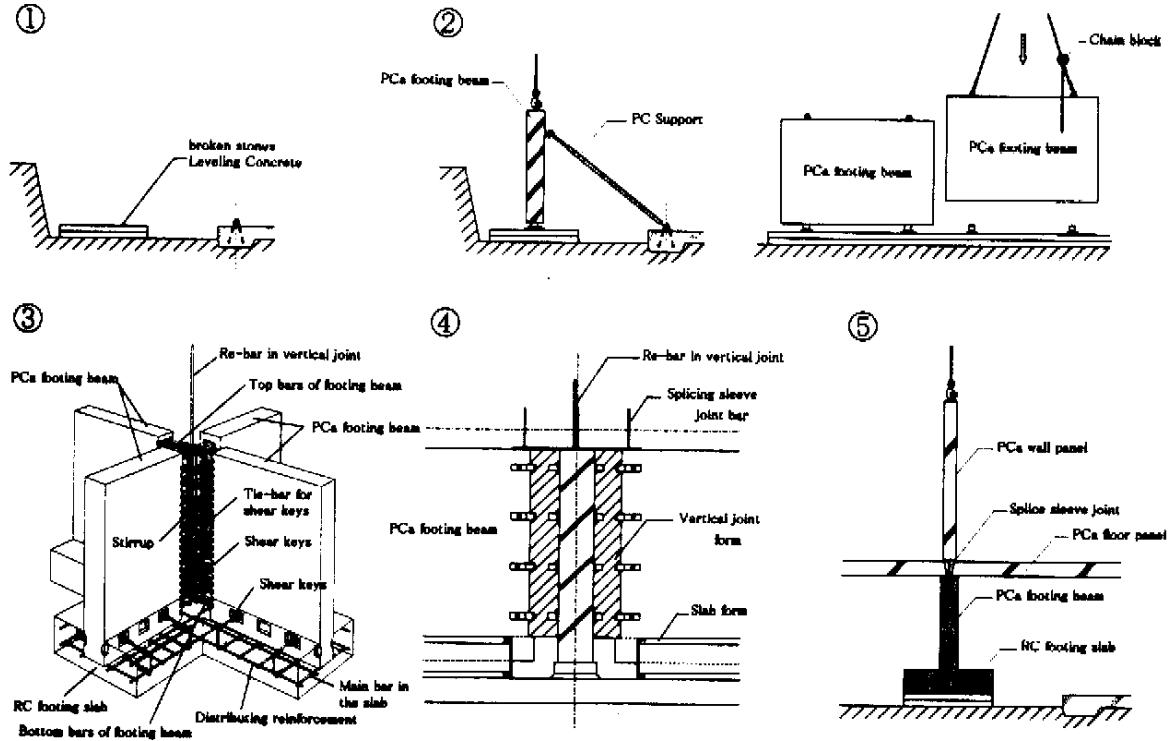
Typical Construction Procedure by PCa system for footing beams
